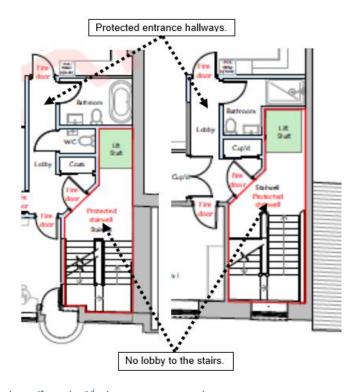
Layout of the 1<sup>st</sup> and 2<sup>nd</sup> Floor Communal Escape.
